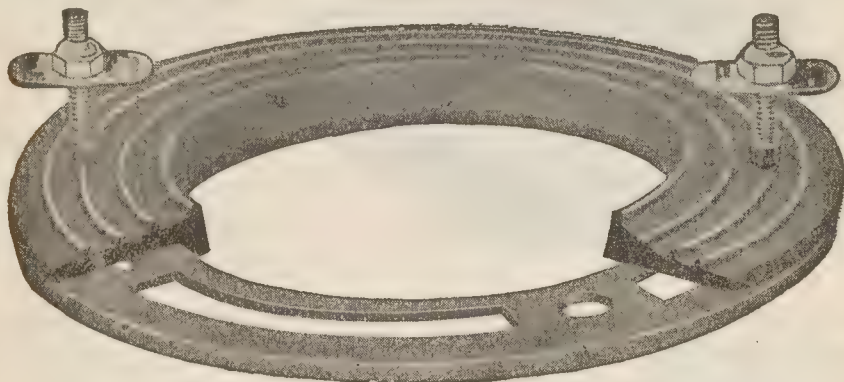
,589.—Wolverine closet floor flange with lip gasket, bolts and washers.
